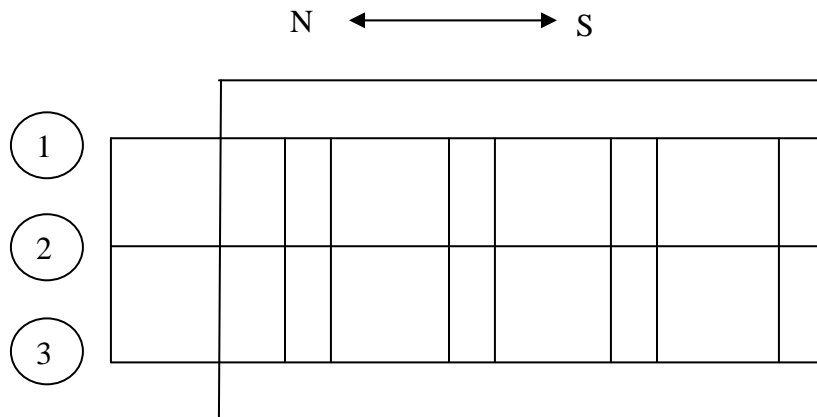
Plan scheme of the principal axes of the structure in north-south direction
